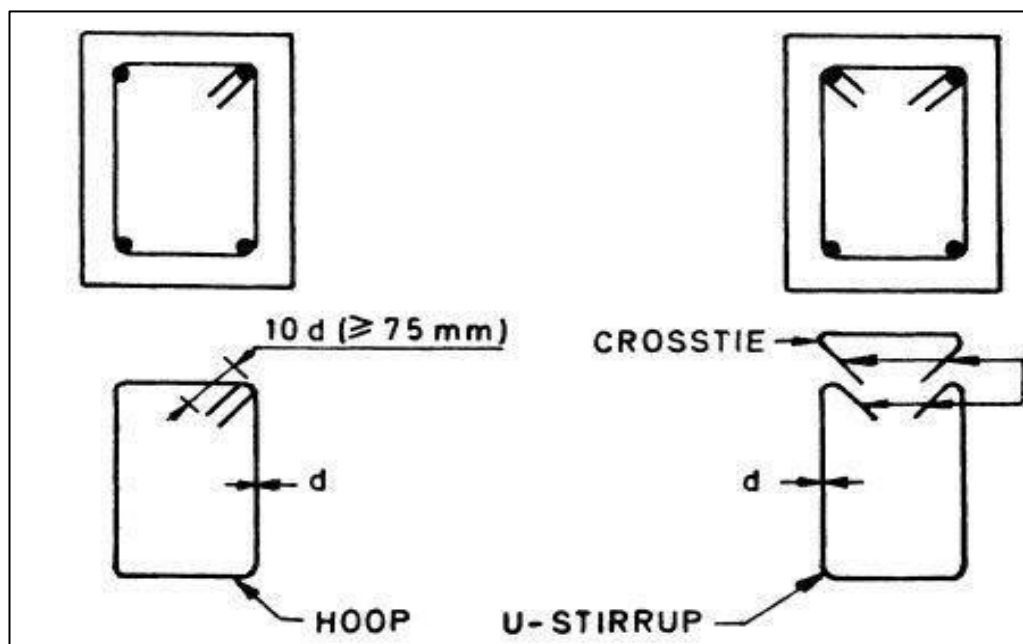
Beam Web Reinforcement as per IS 13920(2016)
